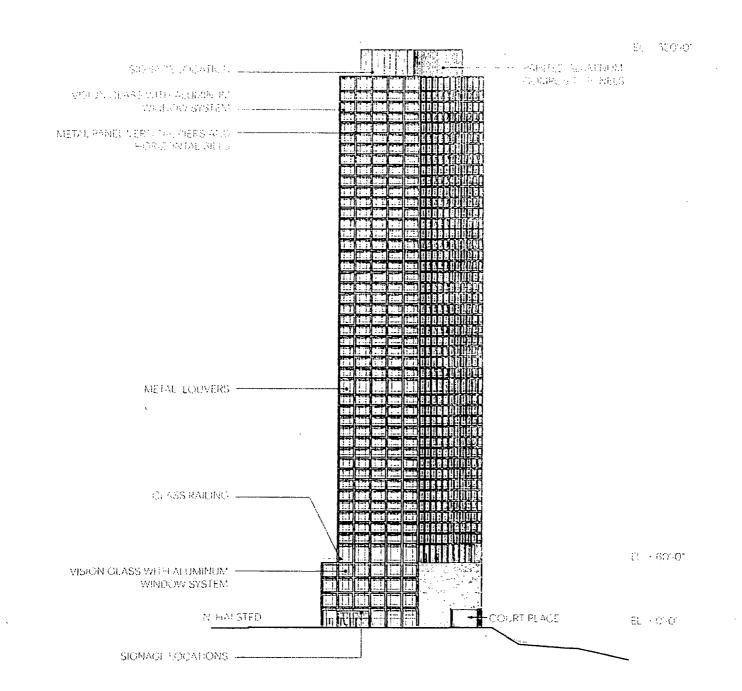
E: COURTYARD NORTH ELEVATION
